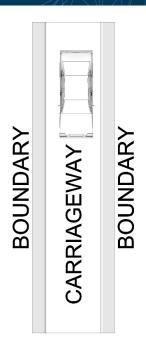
Suburban, live and play, access to houses/townhouses (1 to 3 du, or 1 to 6 du)
